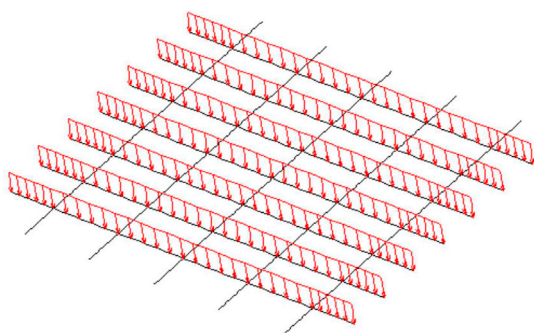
Frame two-dimensional model of the bottom grillage under applied load
